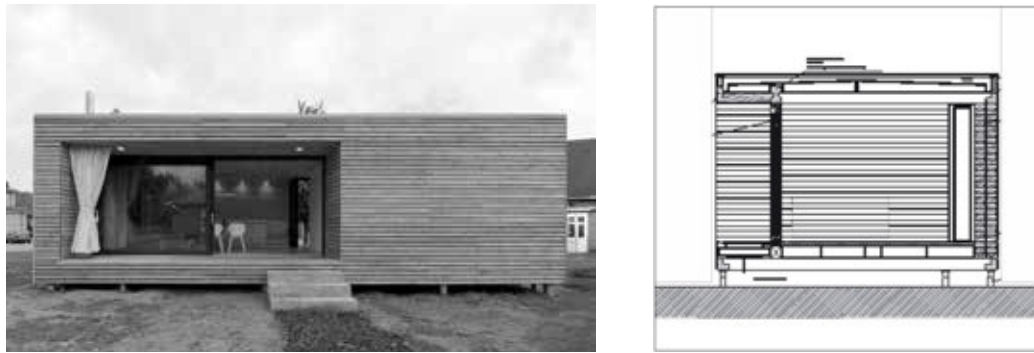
The first demonstrator building 'Timber Prototype 1' built at the Munster School of Architecture (MSA) evaluating the advantages of timber-only construction systems.
